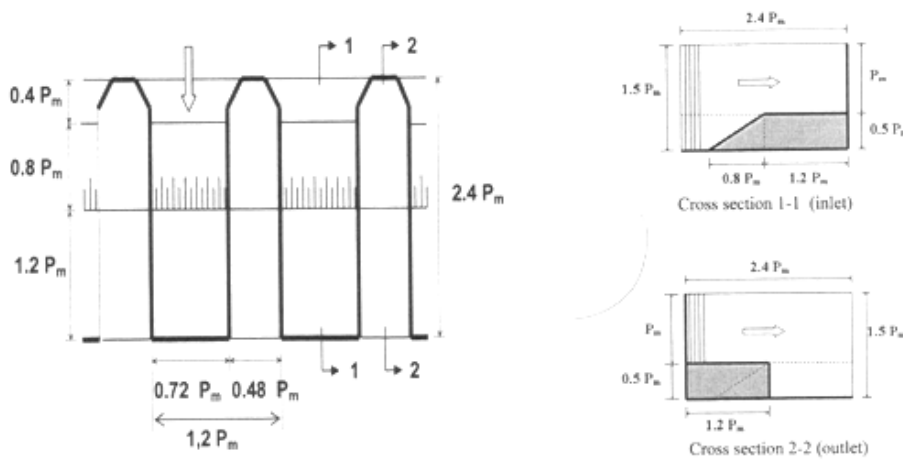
Proposed reference design pour PKW model E – plan view (left) and cross sections (right).
